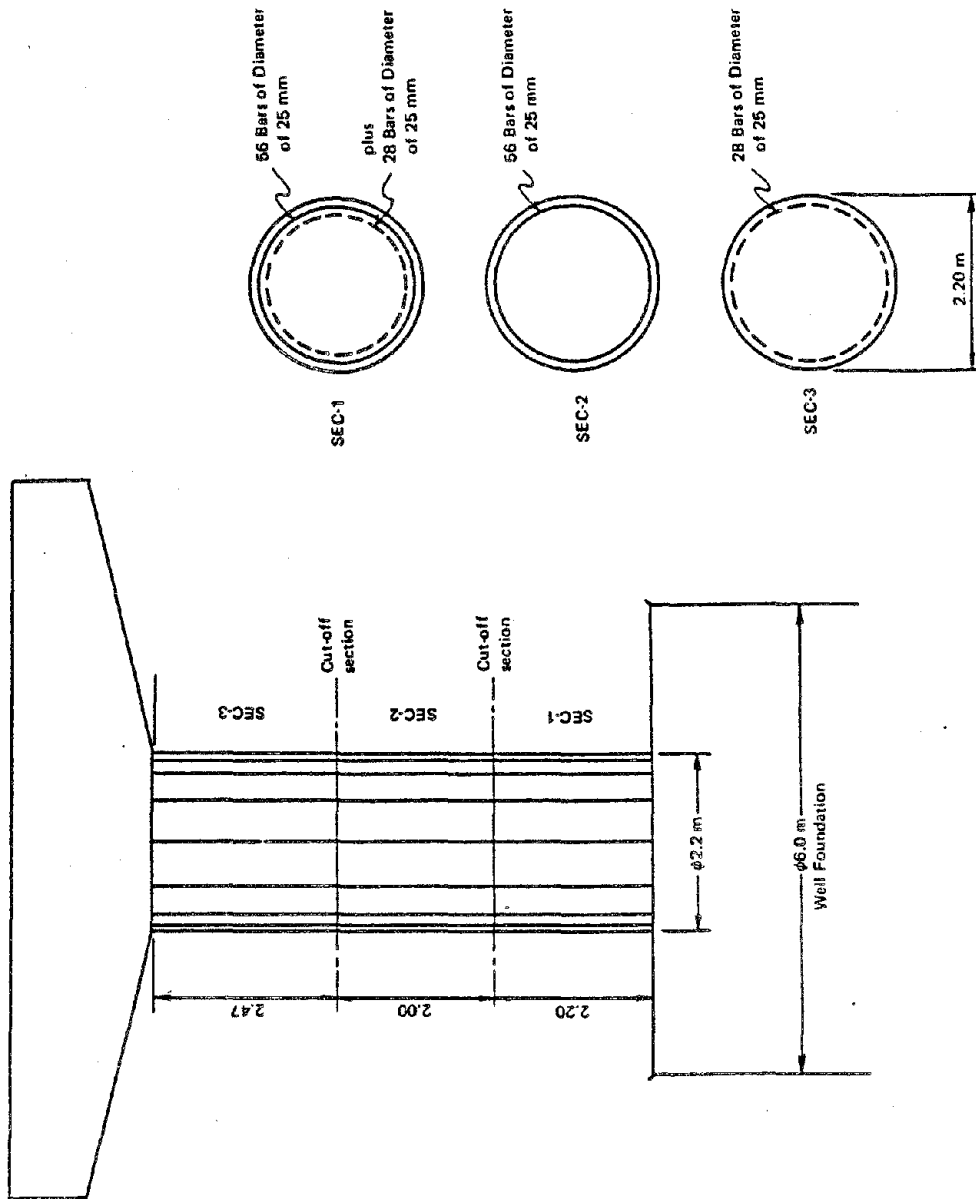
Arrangement of Reinforcement Bars for Column of Pier-3.
